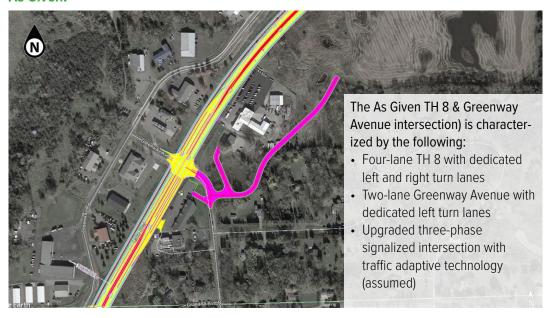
As Given TH 8 & Greenway Avenue intersection
